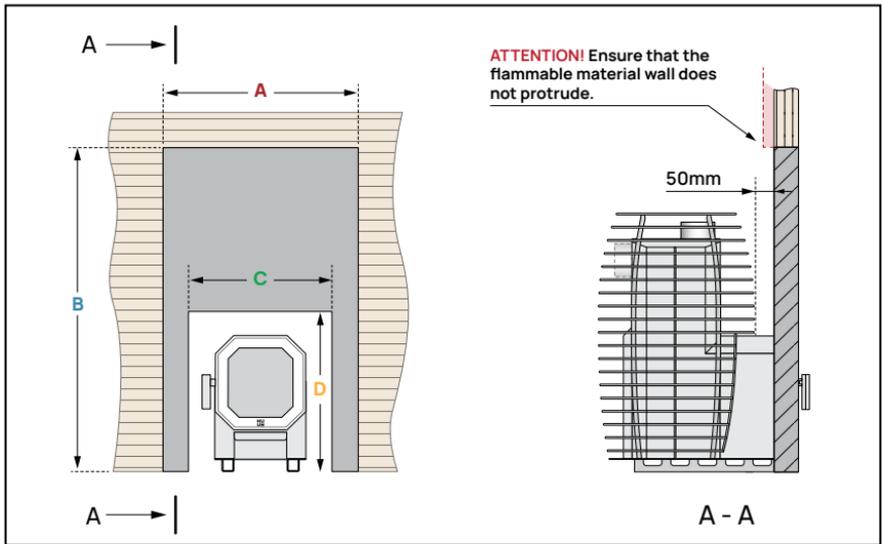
Installing HIVE Flow LS and Flow Mini LS sauna stoves through the wall.
